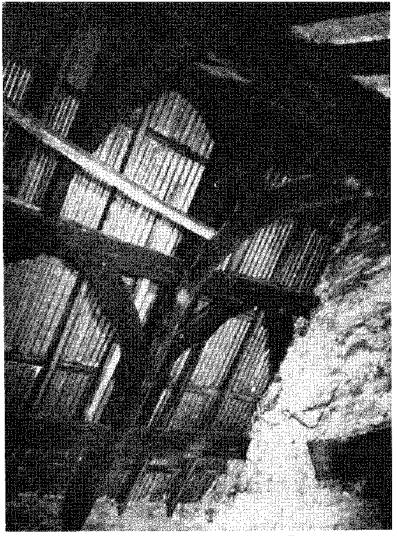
Plas Ucha. Secondary Roof Truss.
